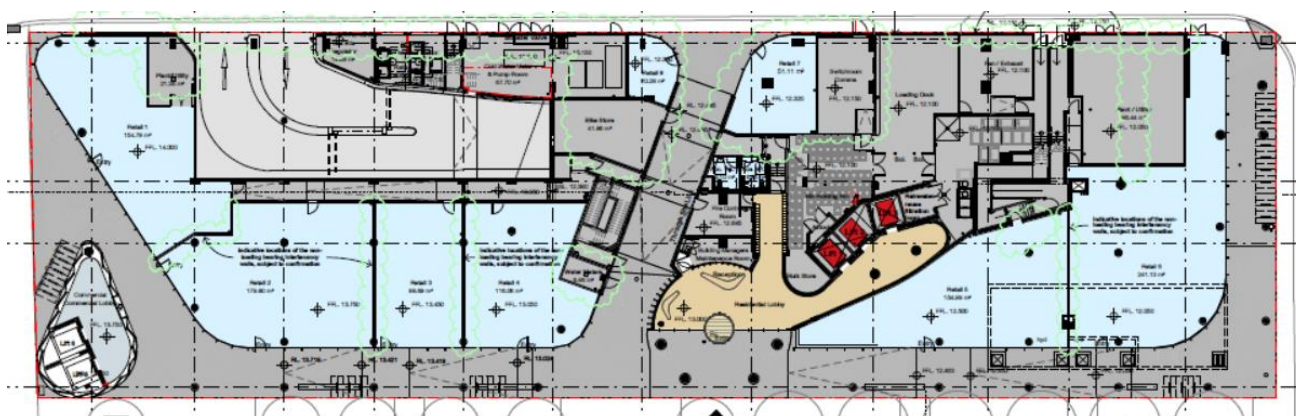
Proposed layout and extent of indicative north eastern façade change on the Ground Floor
